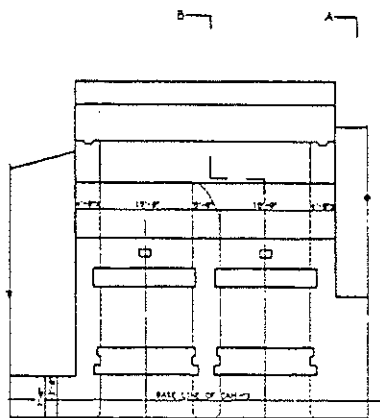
EXHIBIT F      SCALE 1"=40'      SHEET NO. 1
